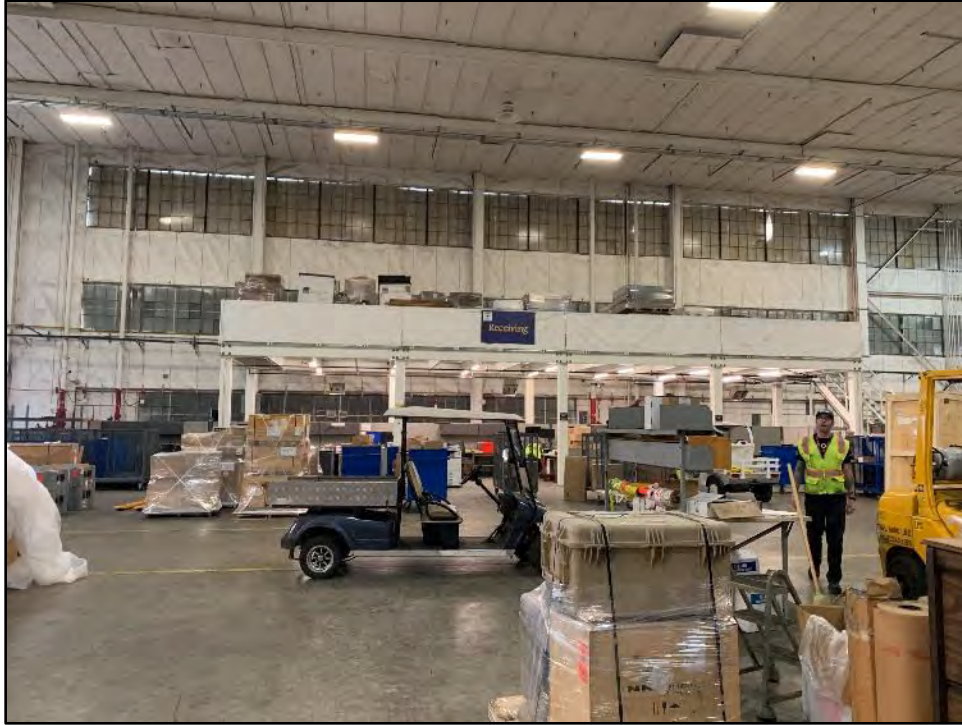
Building 7 Interior, Mezzanine and Original Steel Windows
